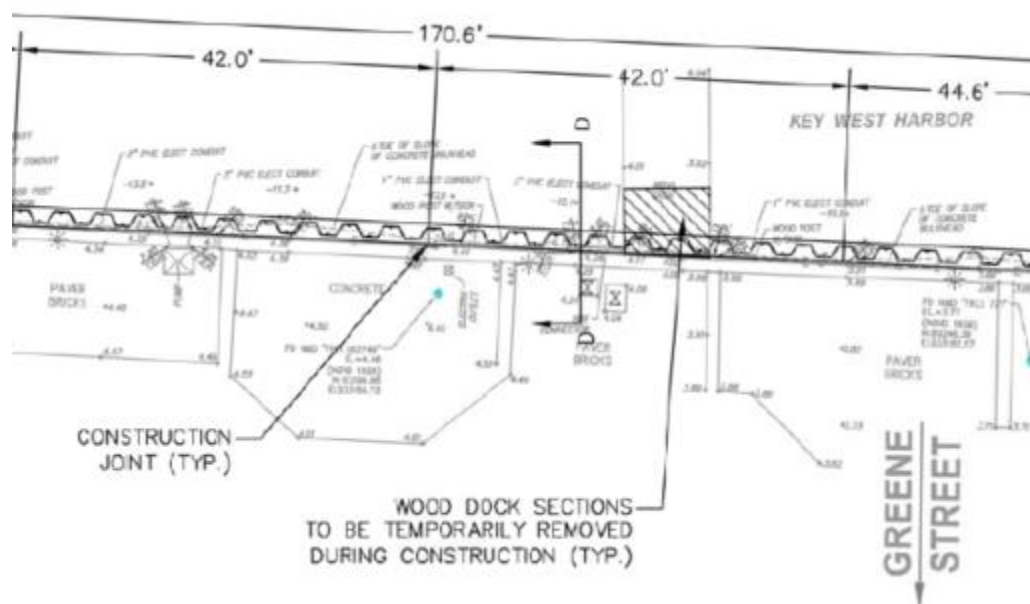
Typical Representation of Steel Sheet Cantilever Wall along Baseline C
